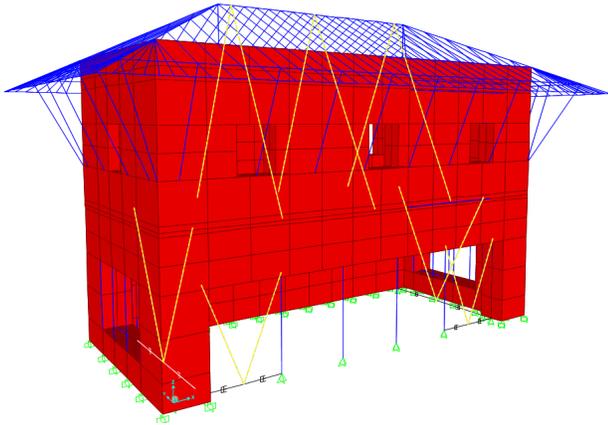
3D View of simulated structure with bracing and damping system incorporated
